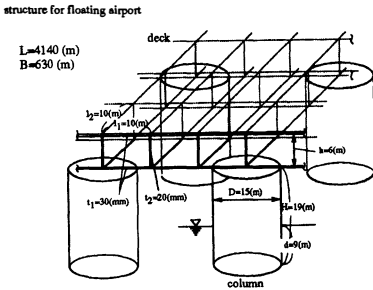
Deck Structure and Column of Column Type Semisubmersible for Floating Airport
